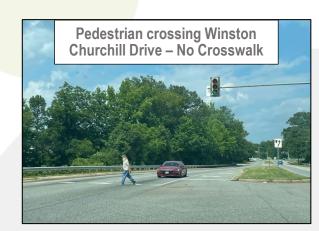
Intersection of Winston Churchill Drive and Oaklawn Boulevard/Sunnyside Avenue
